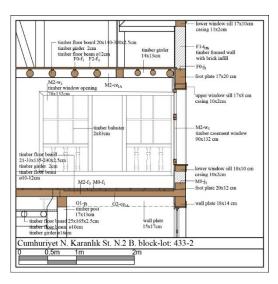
Drawing of simple timber flooring used in the sofa on the first floor and mezzanine floor (Cumhuriyet N b.block-lot: 433-2)
